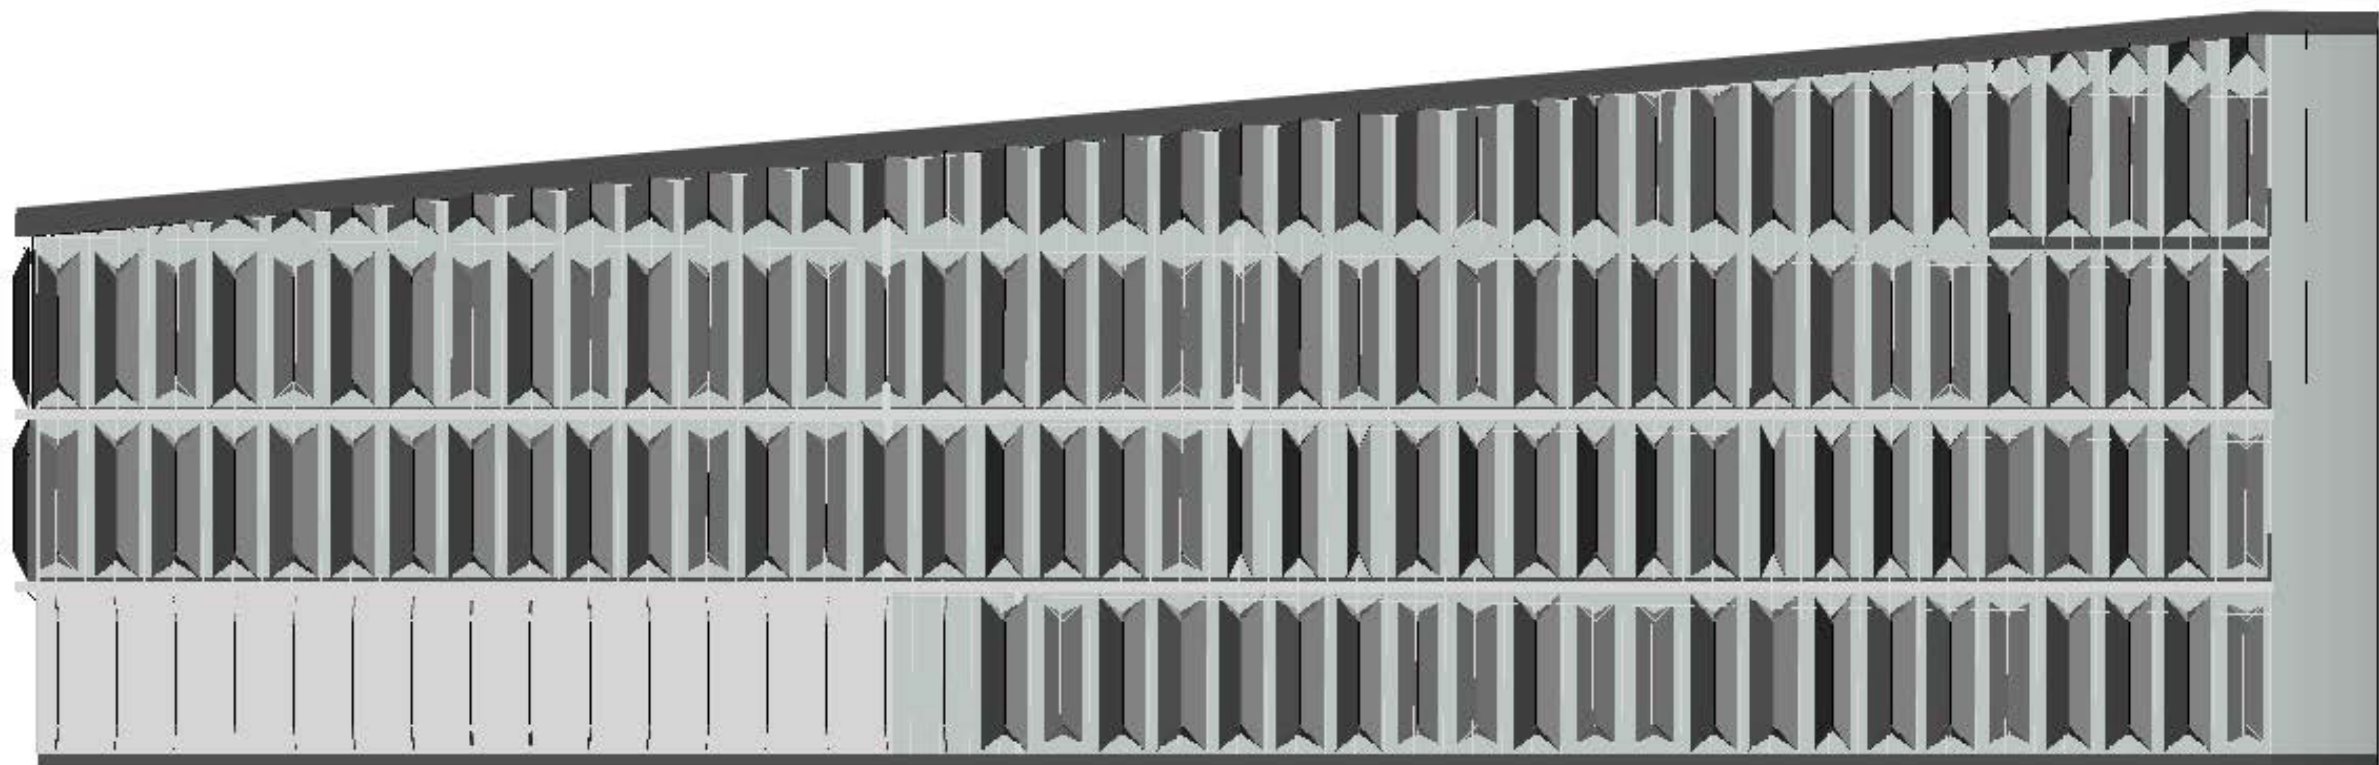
Elevation D with optimal kinetic facade pattern at 3 pm.
